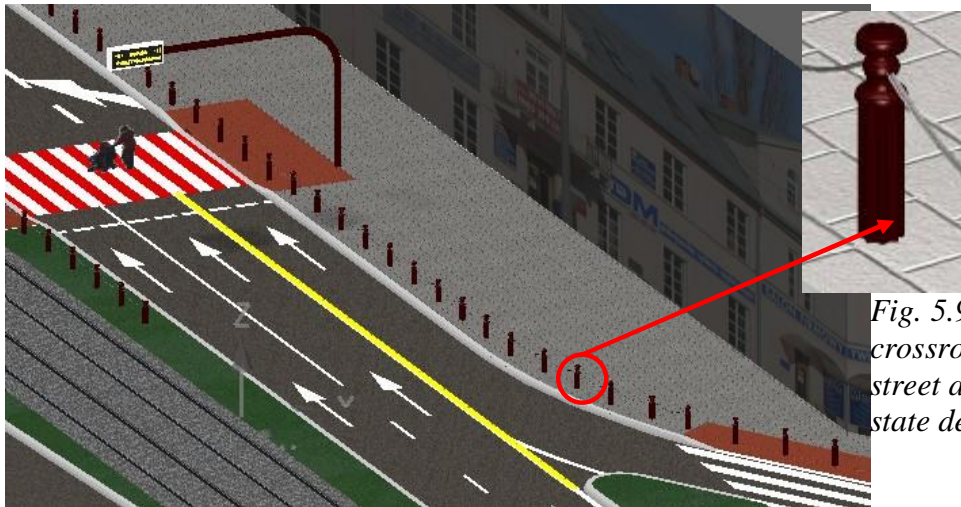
Pillars within crossroad Grochowska street and Mińska street - state design.
